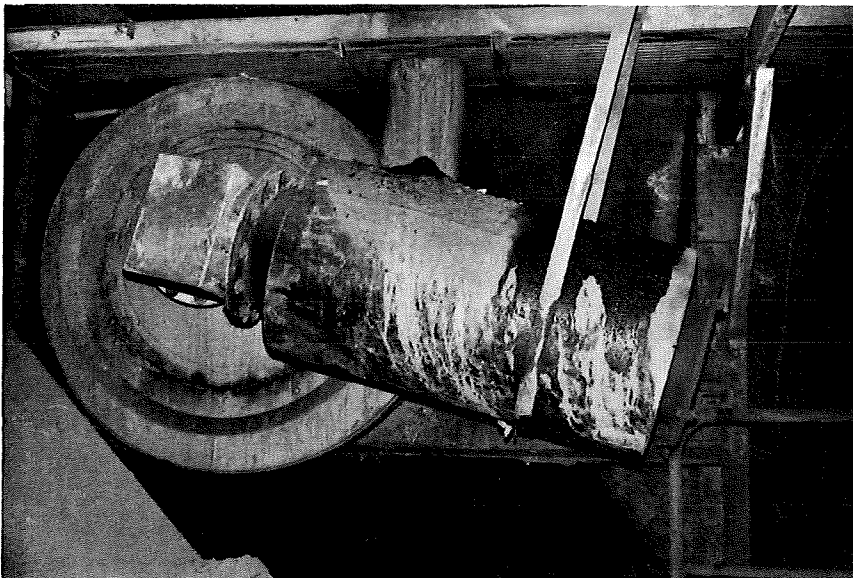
MUFFLER ON JIG AIR INTAKE BLOWER (BUILDING A, LEVEL 6).
